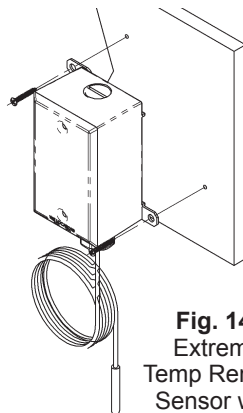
Extreme Temp Remote Sensor with Weatherproof (WP) Enclosure
